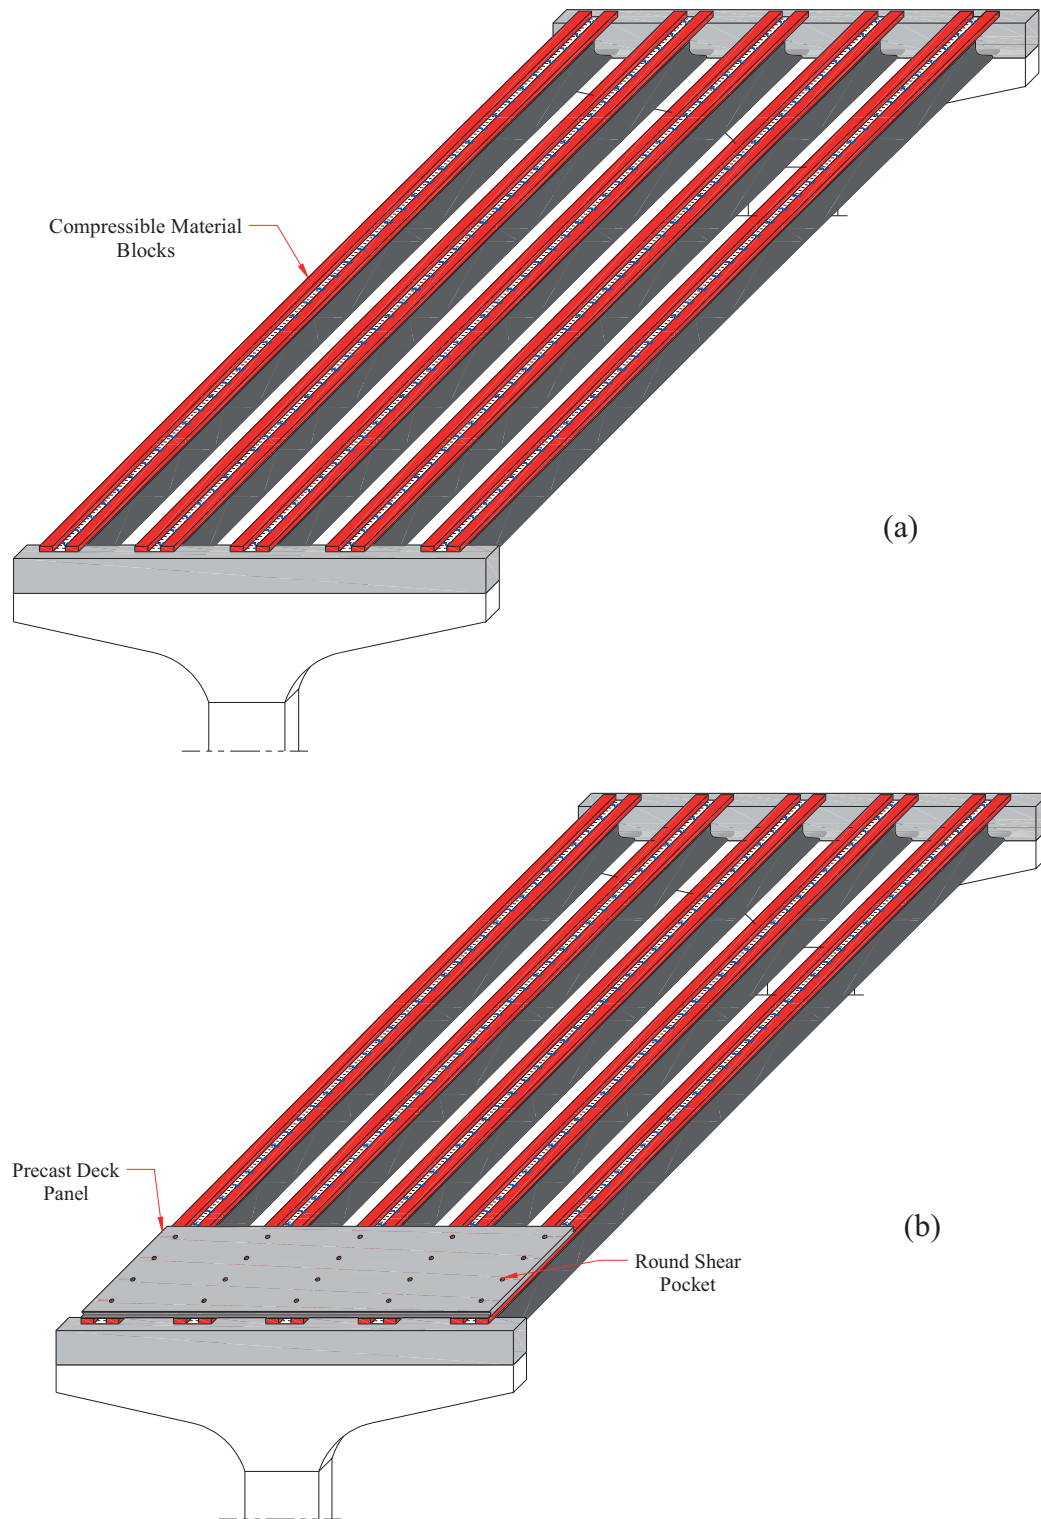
Construction Sequence of the Proposed Precast Concrete Deck-to-Concrete Girder Connection Using UHPC
